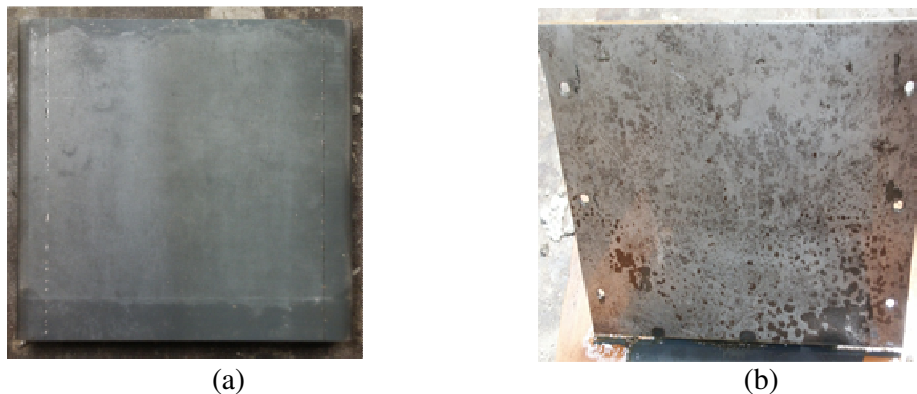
Formwork surface: (a) new wall; (b) used wall
